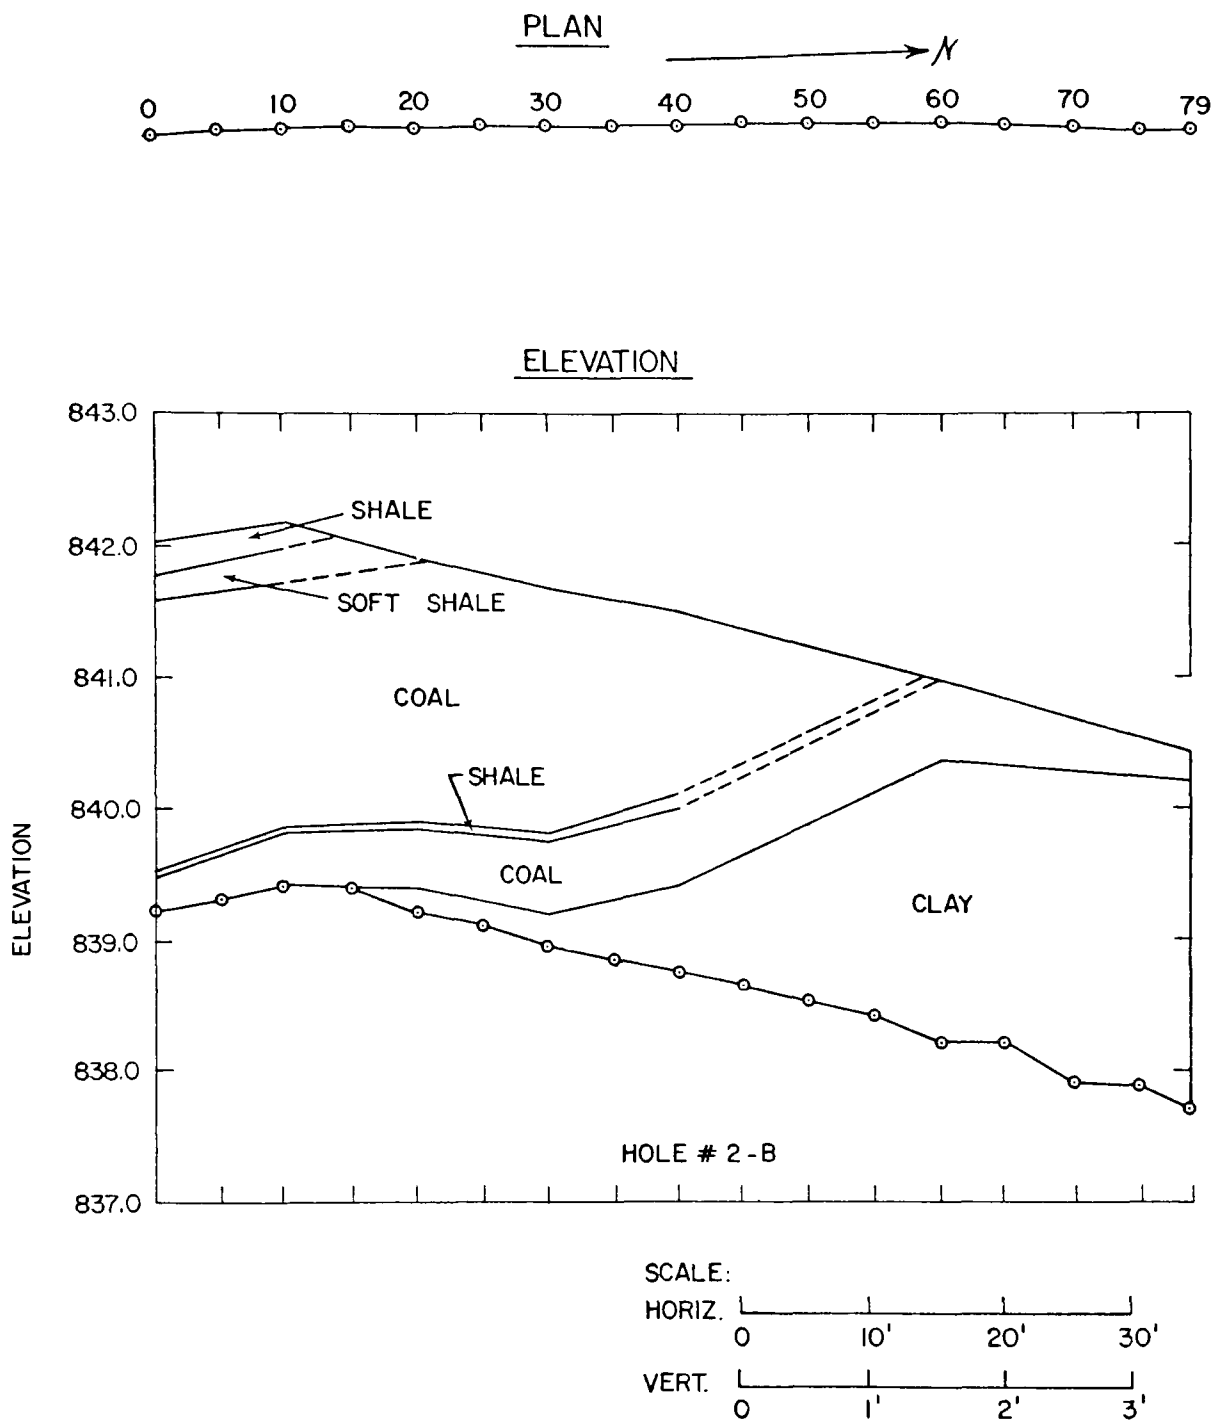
Plan and Elevation Views of Hole No. 2B
